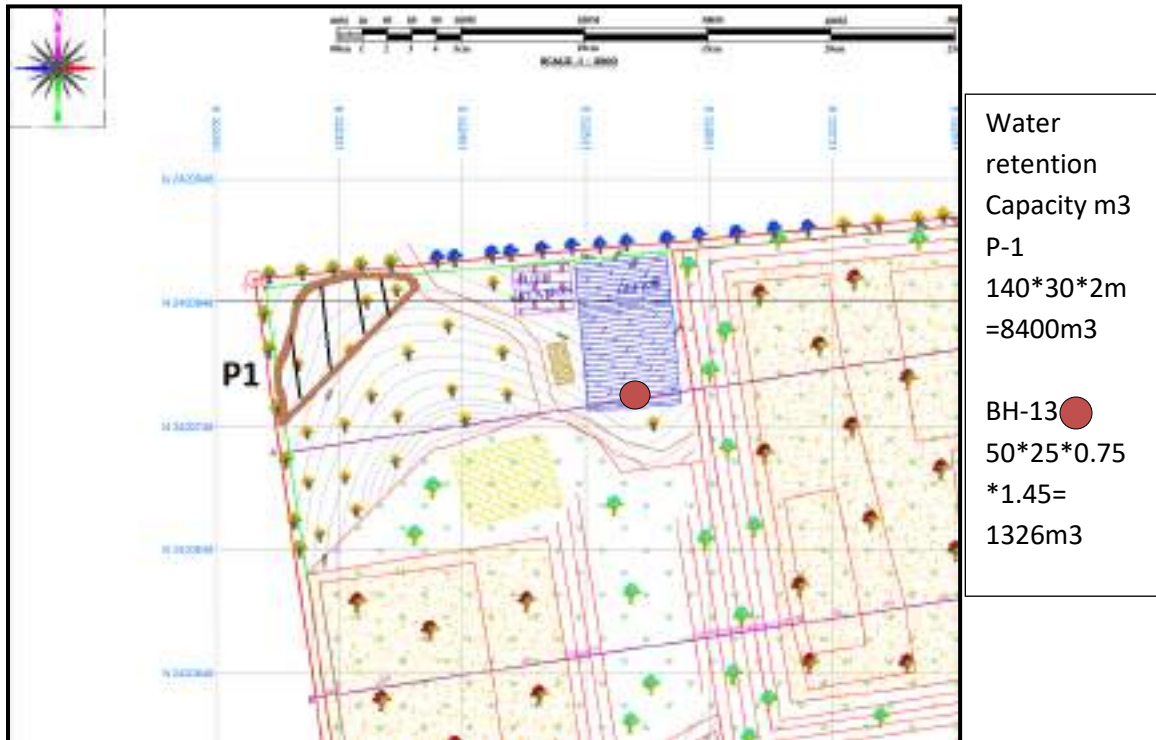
Proposed location of Pond (P1) and roof top RWH structure in lease area
